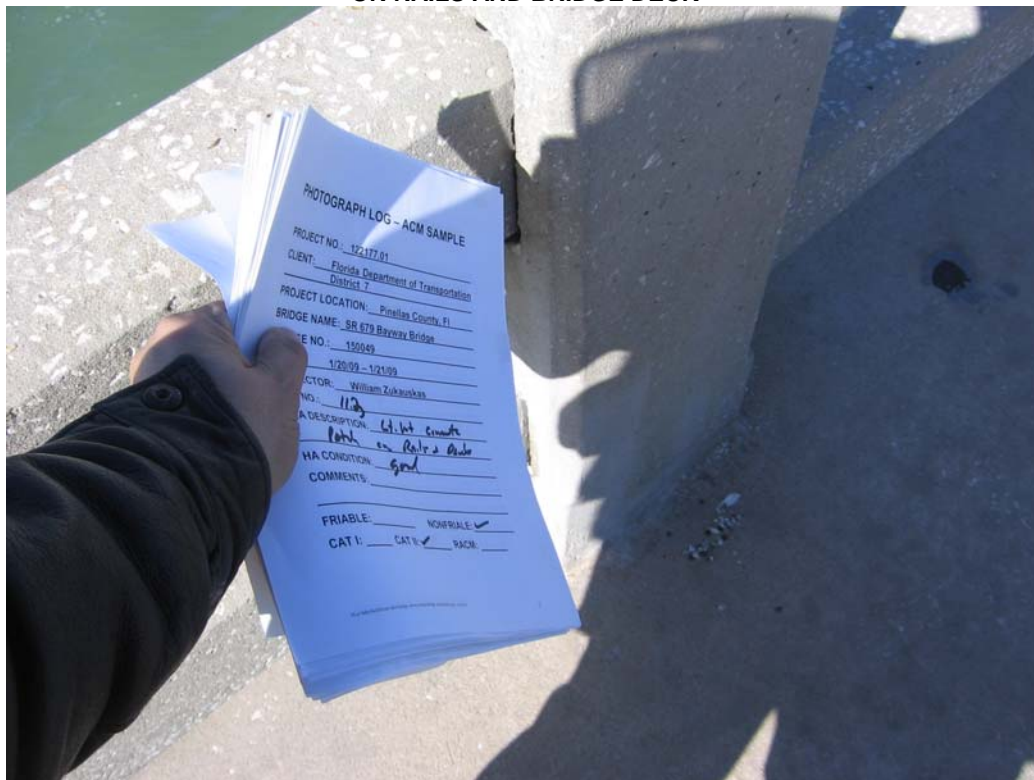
01/21/09 – SAMPLE 10.3 – HA 10
